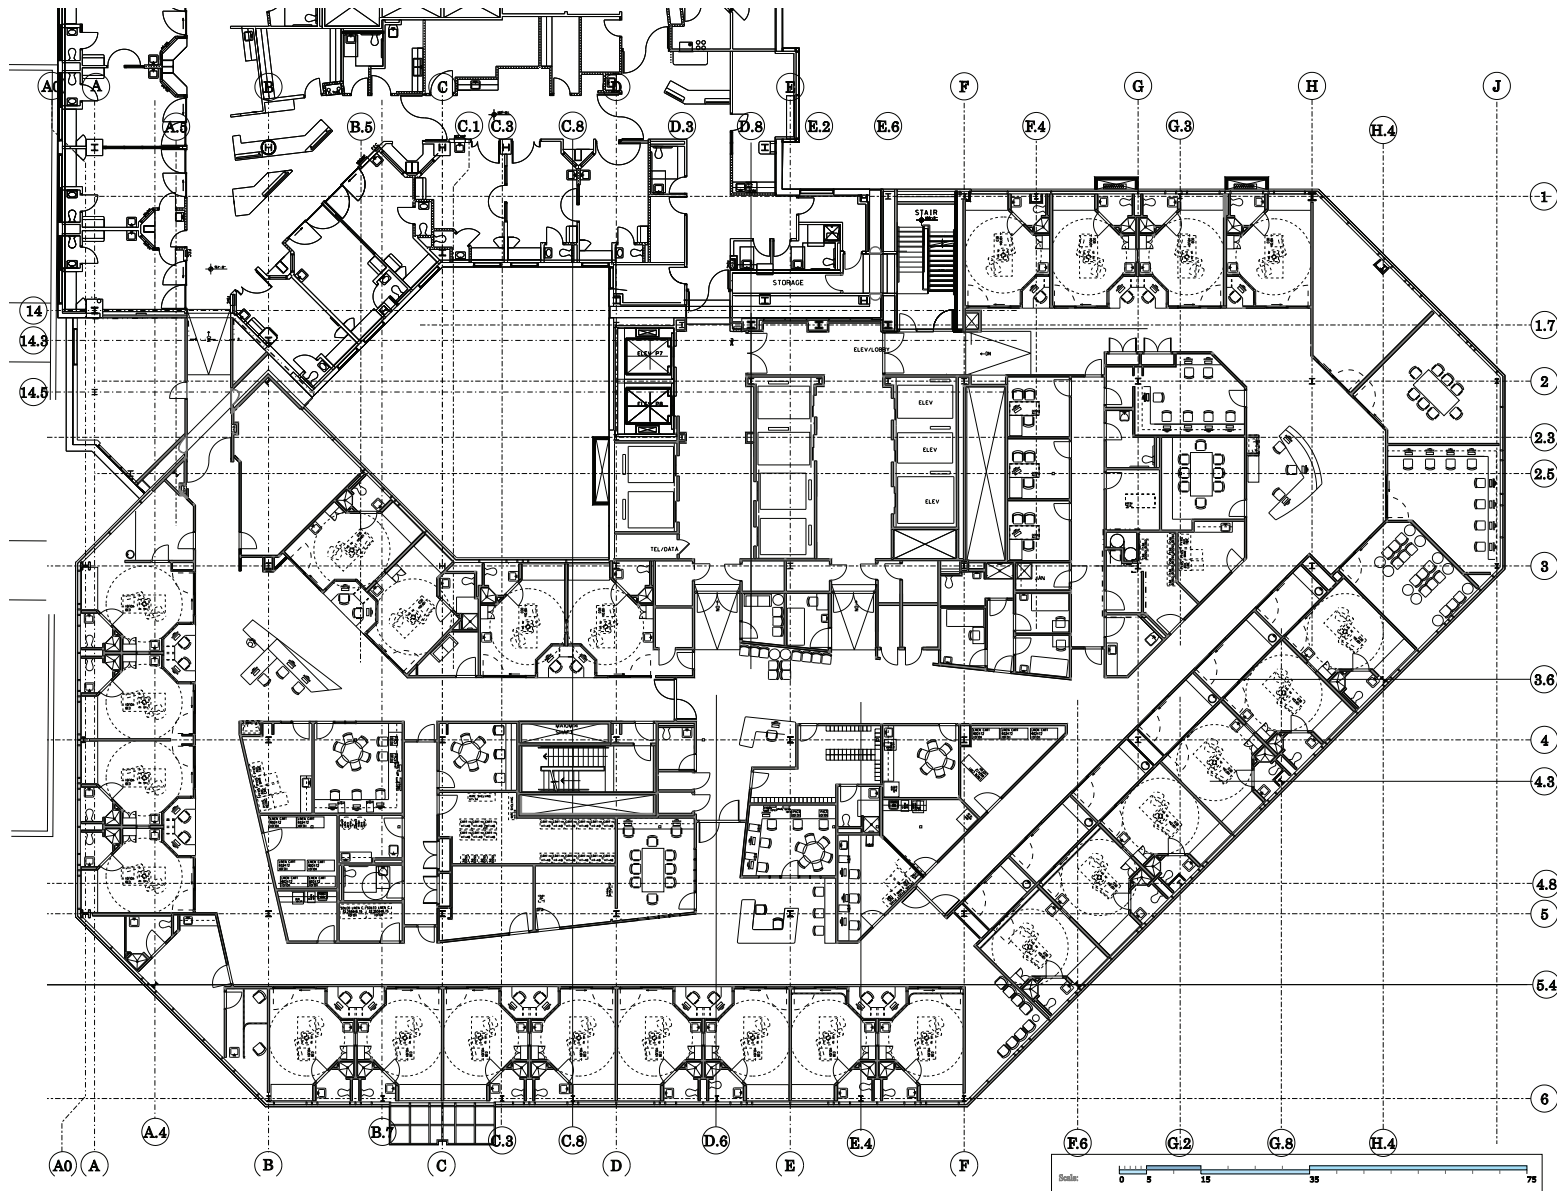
INPATIENT EXPANSION - FLOOR 11 PLAN
